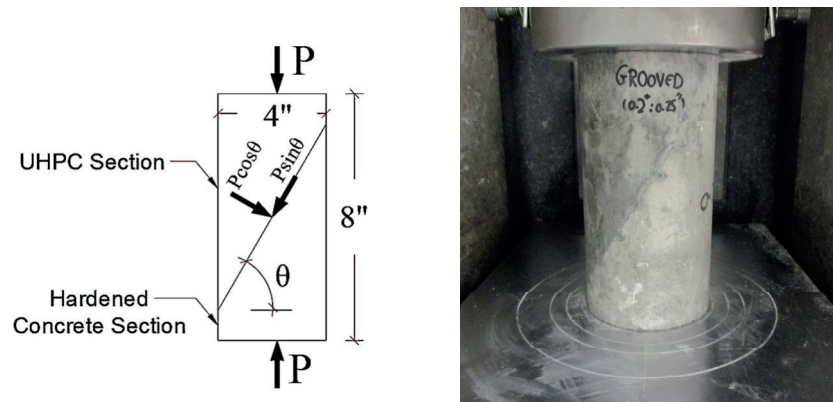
Slant Shear Test Specimen Dimensions and Test Setup (in.).
